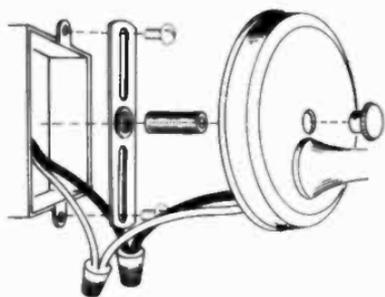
Wall fixtures are frequently mounted to the smaller outlet- or switch-type boxes. If the fixture has a center nipple, obtain a bracket that has a threaded hole in the center to take the nipple.
